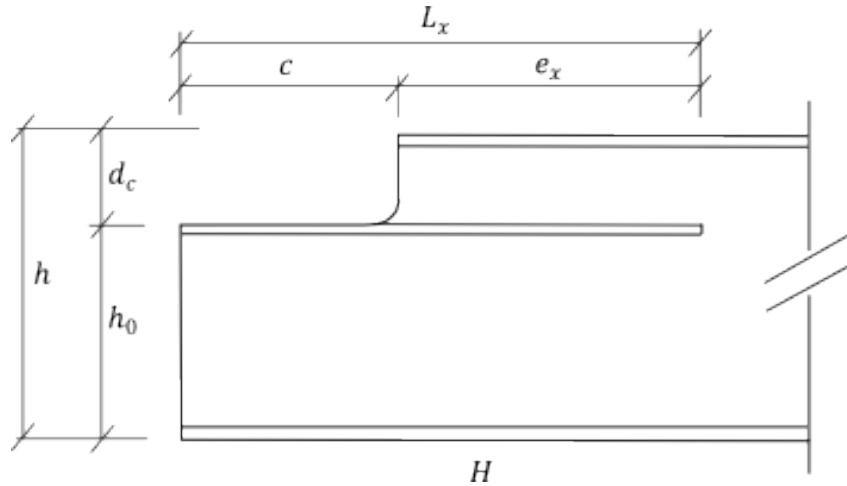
Reinforcement detail for coped beam with horizontal stiffener.
